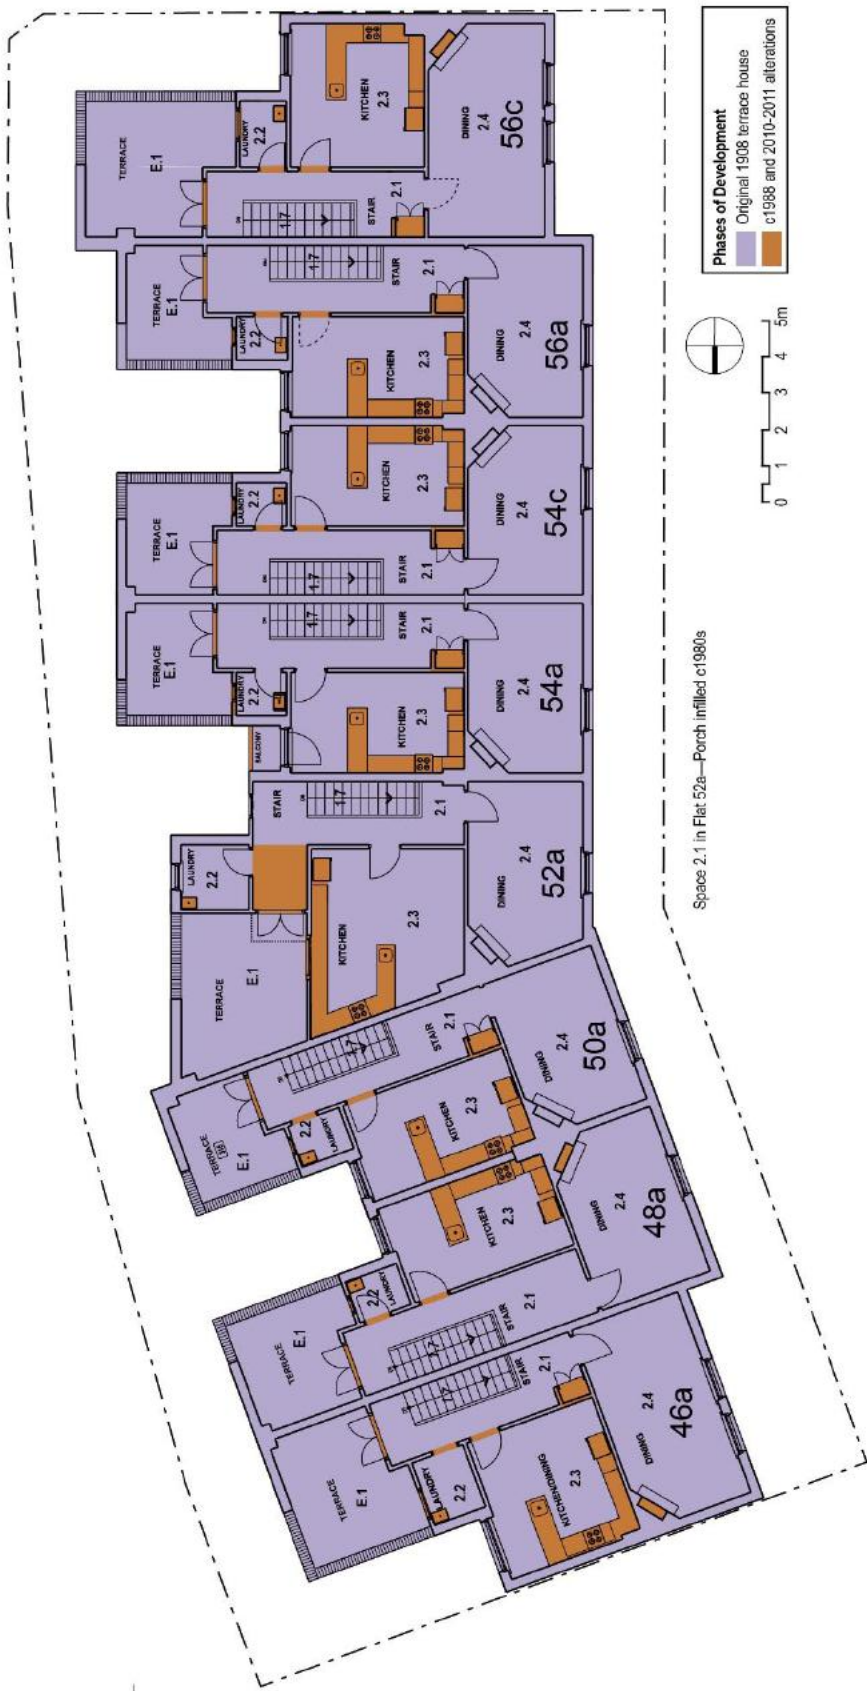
Diagram showing periods of construction—second floor plan (upper flats). (Source: LAHC, with GML overlay 2016)
